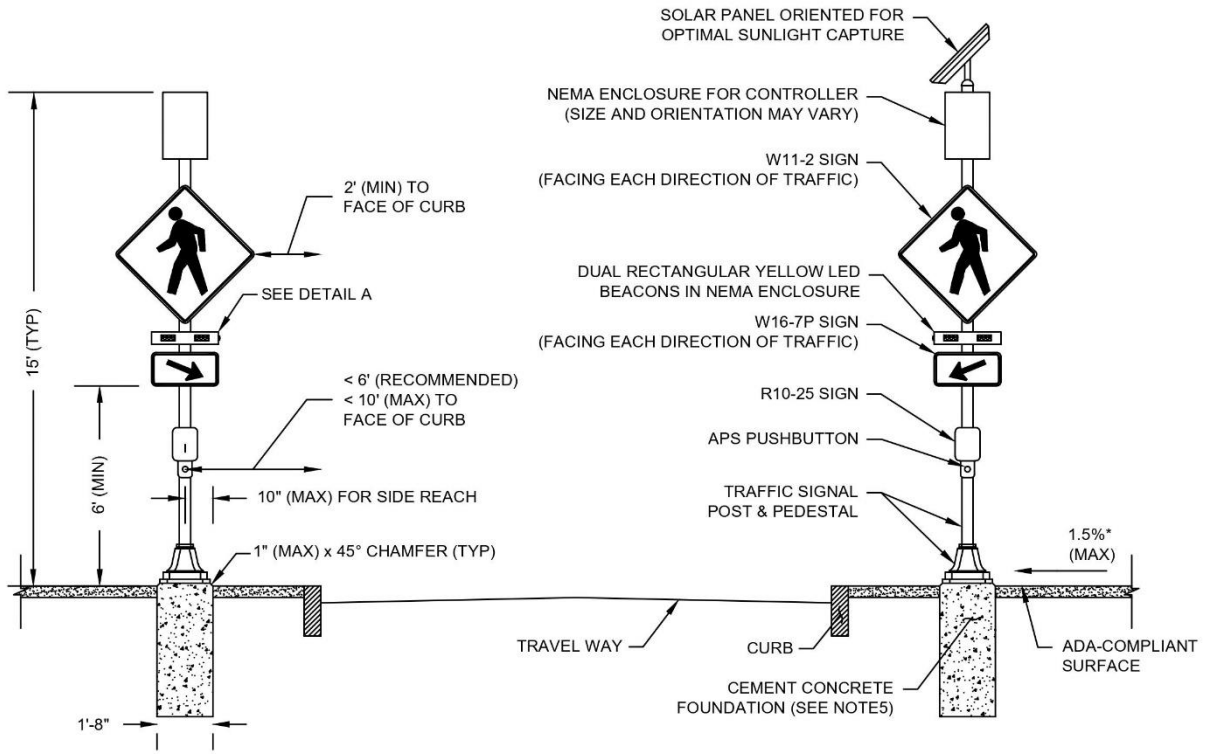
DETAIL: SUPPLEMENTAL RECTANGULAR RAPID FLASHING BEACON (LOCATION 13)
